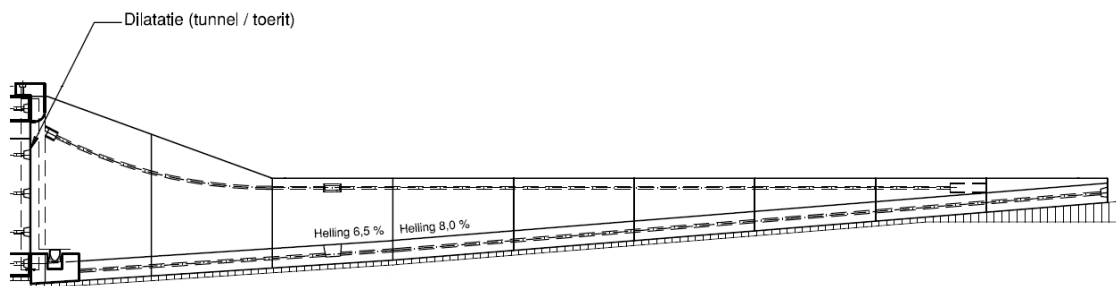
Prefab elements used for access ramp, according to [34b]
